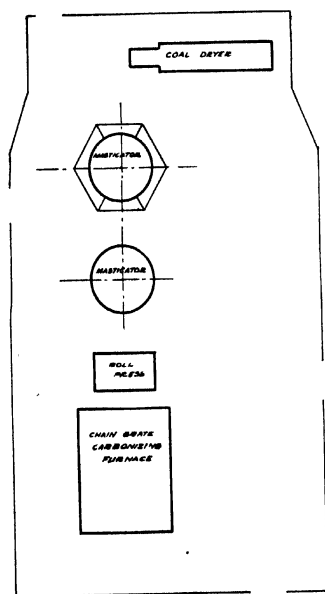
Layout Plan of the Briquetting Plant of the New Jersey Zinc Company, Palmerton, Pa.
